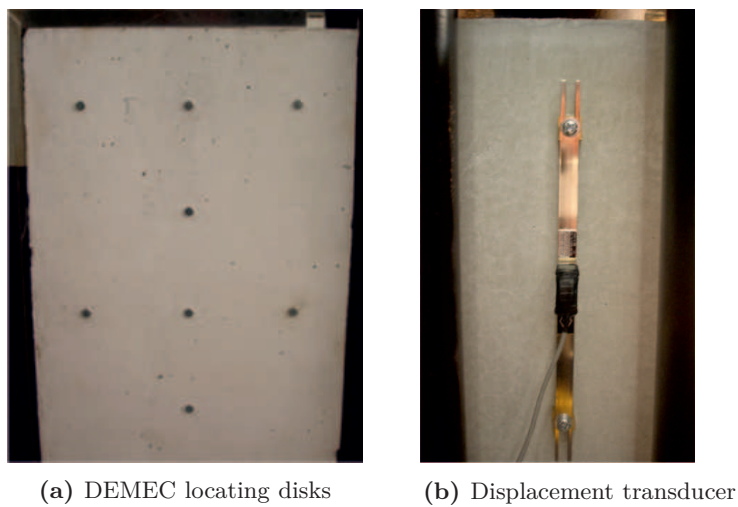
Specimens P1, P2 and P3 measuring equipment
